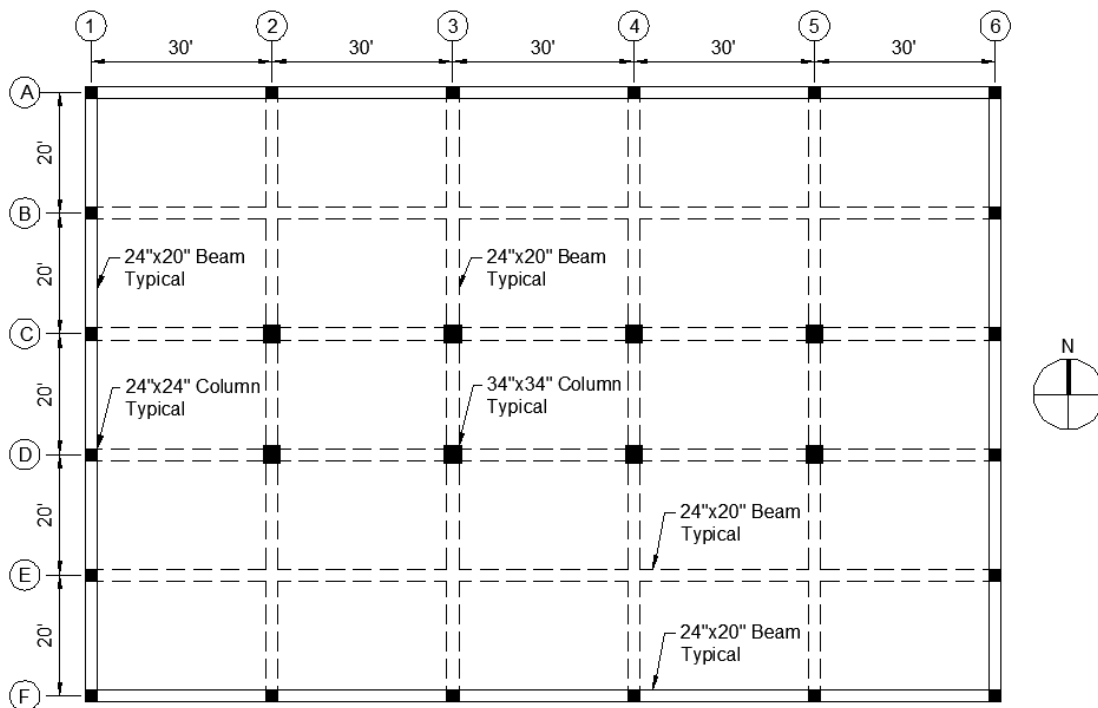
Plan layout of the prototype building (Lew et al. 2014)
